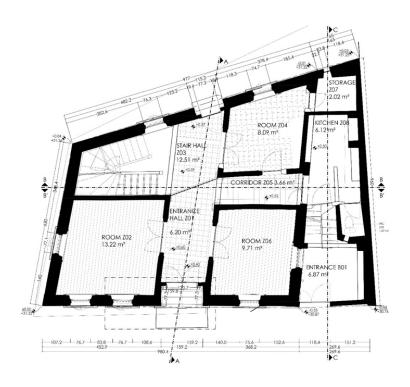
Ground floor plan of the house in Basmane (Source: Düzalan and Açan, 2016)
